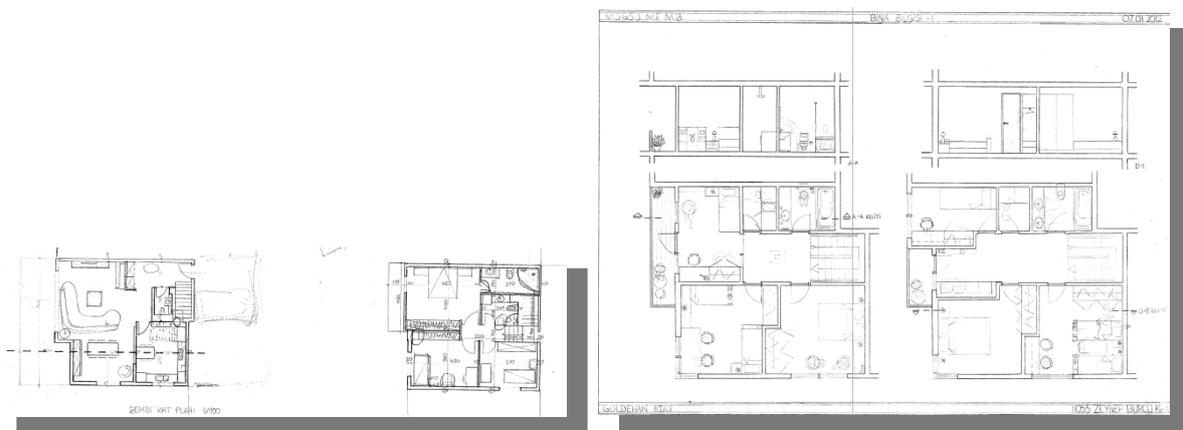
(a) The existing plan, starting point; (b) The final proposal, planning a “sofa” space
